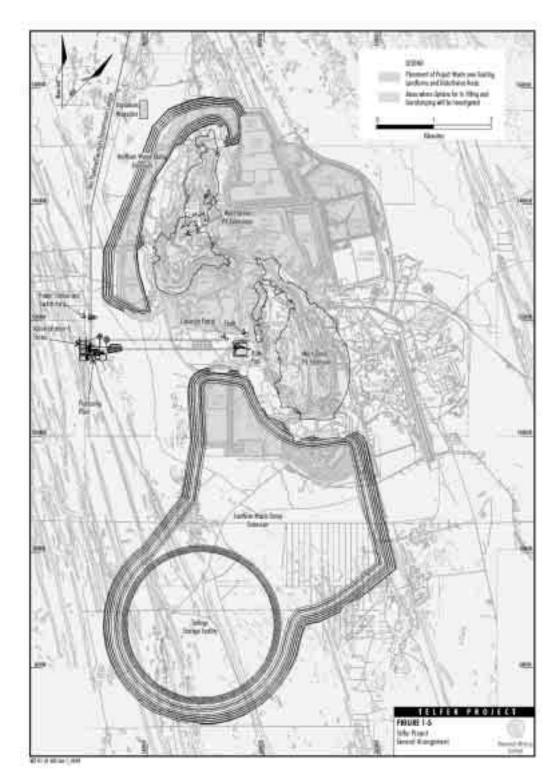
Telfer Project Expansion, General Arrangement (Source: Newcrest Mining Limited, 2002a)
